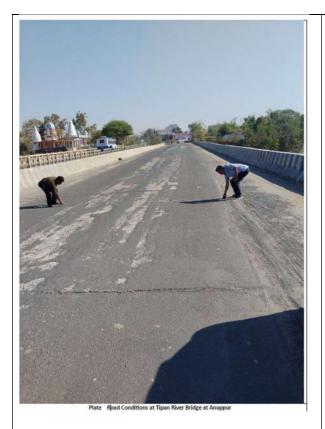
Road Conditions of Anuppur (Tipan road bridge, City and National Highway)
